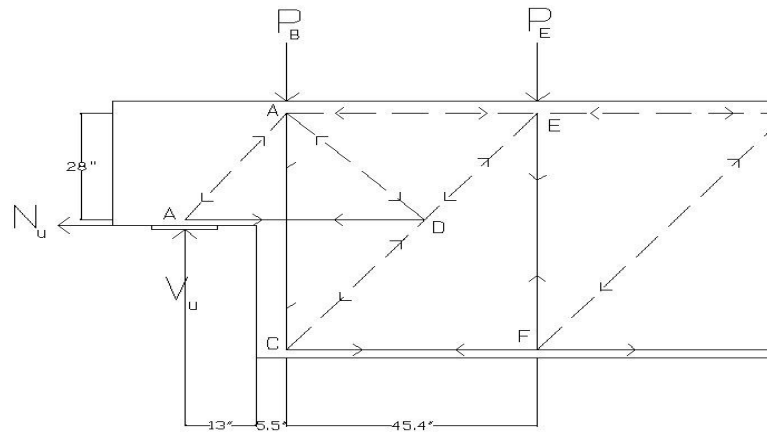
Diagram showing the Strut and Tie model used for detailing the Dapped End of girders
